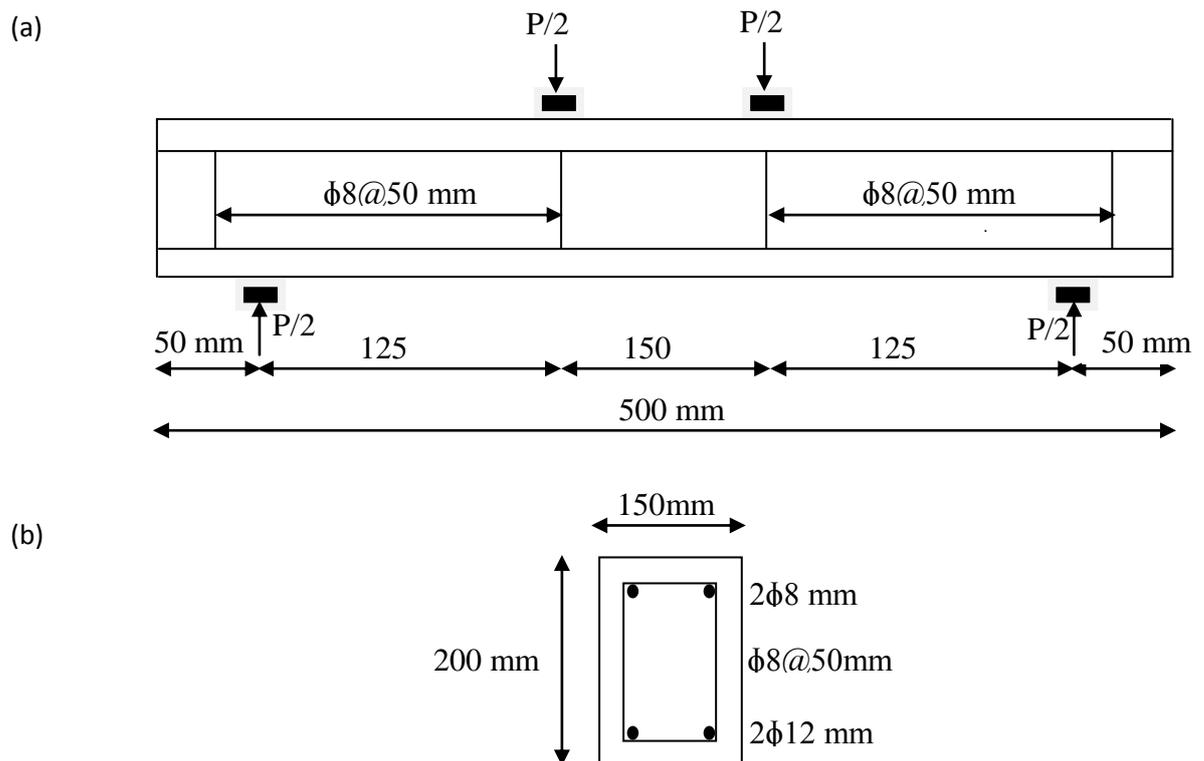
Heated Beam (a) layout and (b) Cross section
